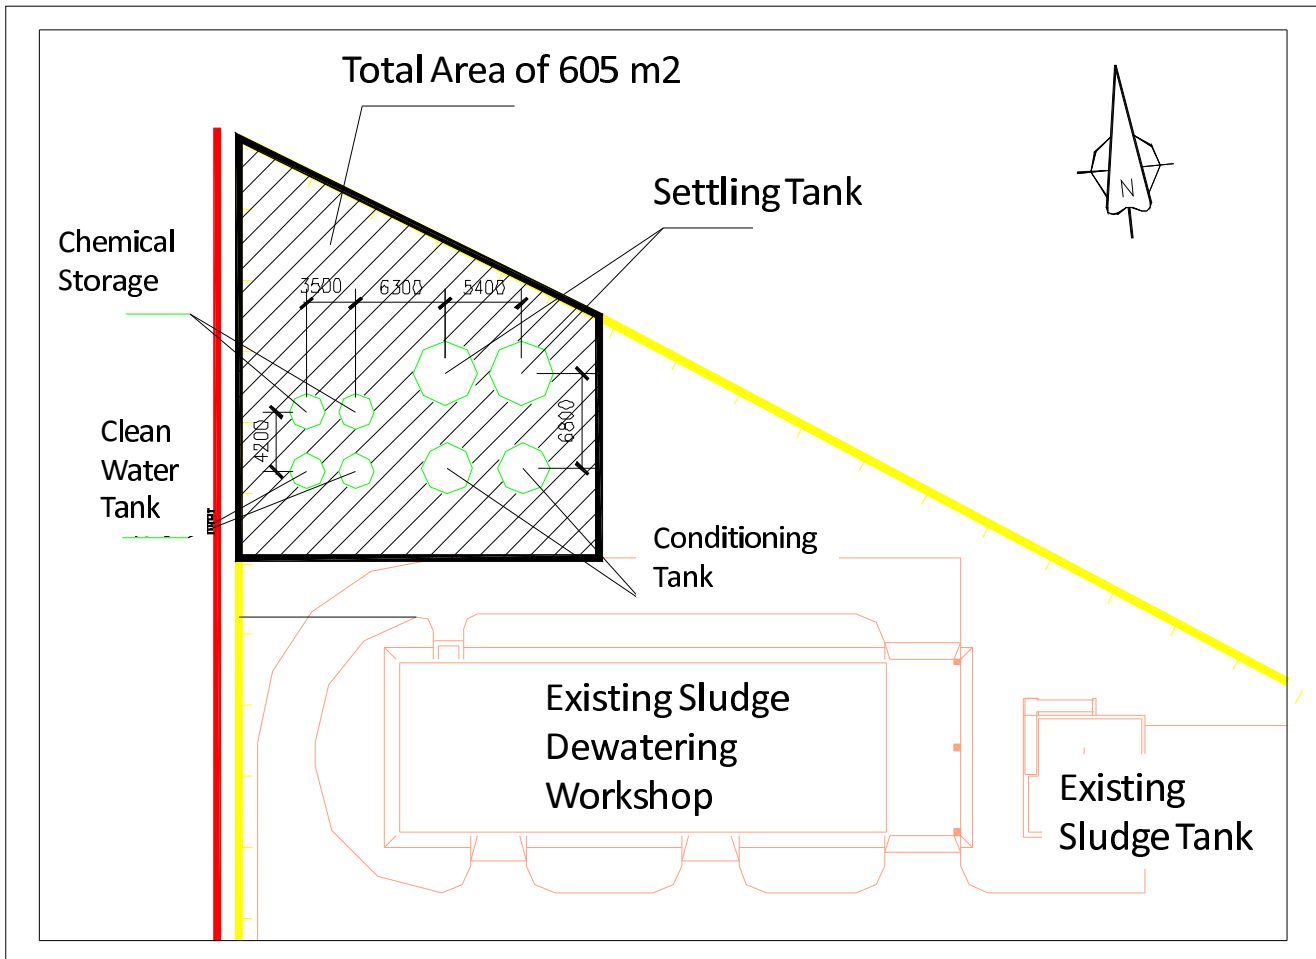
Layout of Chengbei WWTP Sludge Dewatering Workshop Scale 1:500
